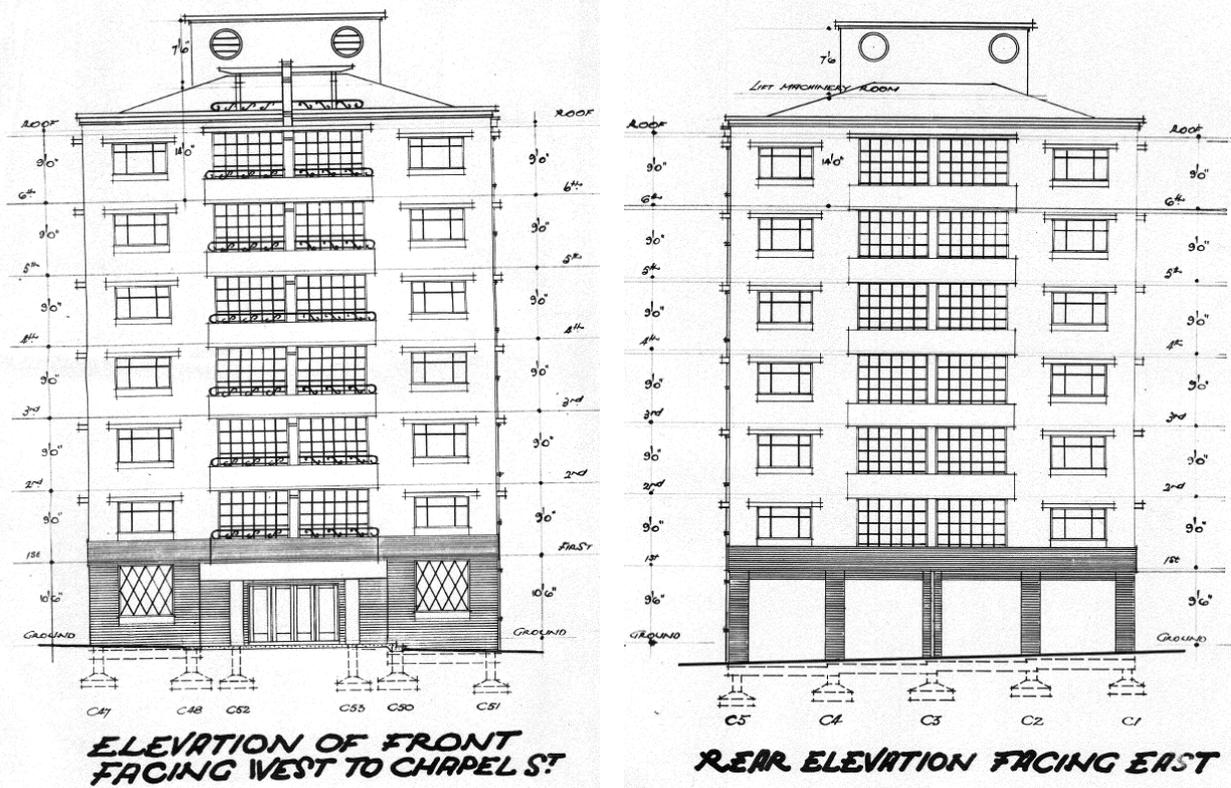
drawings for original 7 storey design – front (west) and rear (east) elevations (Source: BP, sheets 7 +8)
